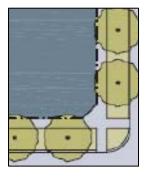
Planters shall be provided along the Memorial Drive Corridor to beautify the corridor and ensure pedestrian safety. (Source: Duany Plater-Zyberk & Co.)
